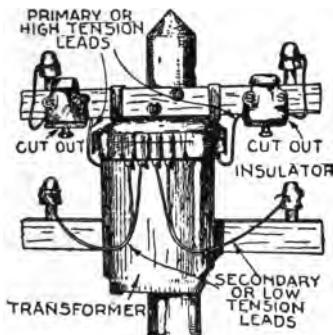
,550.—Installation of a transformer on pole; view showing method of attachment and disposition of the primary and secondary leads, cut outs, etc.
